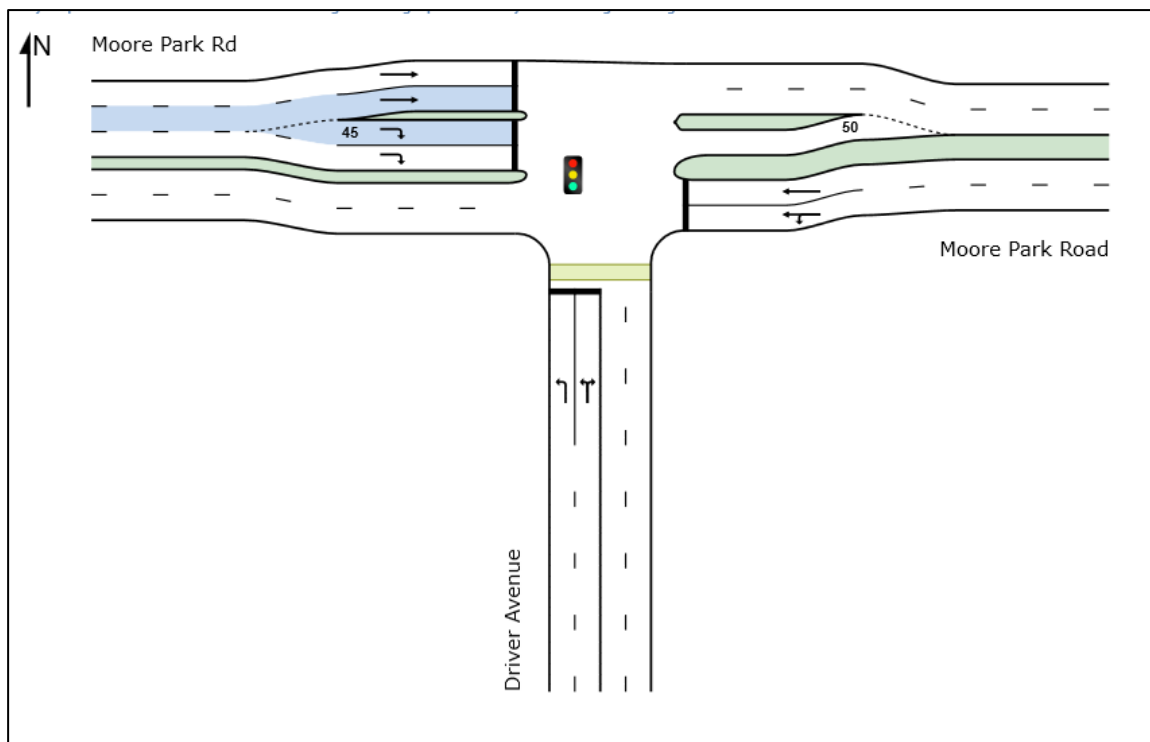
SIDRA intersection layout showing merge required for eastbound traffic
